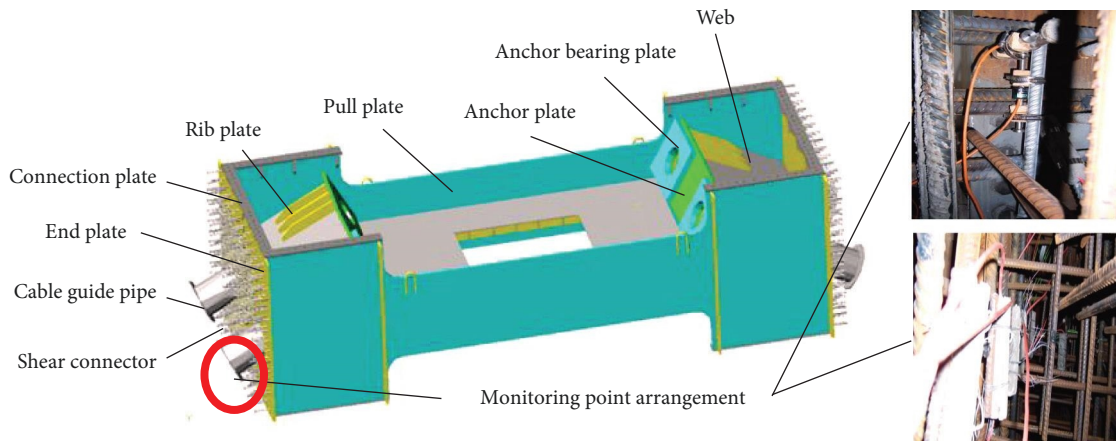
Steel anchor box structure and monitoring point arrangement diagram.
